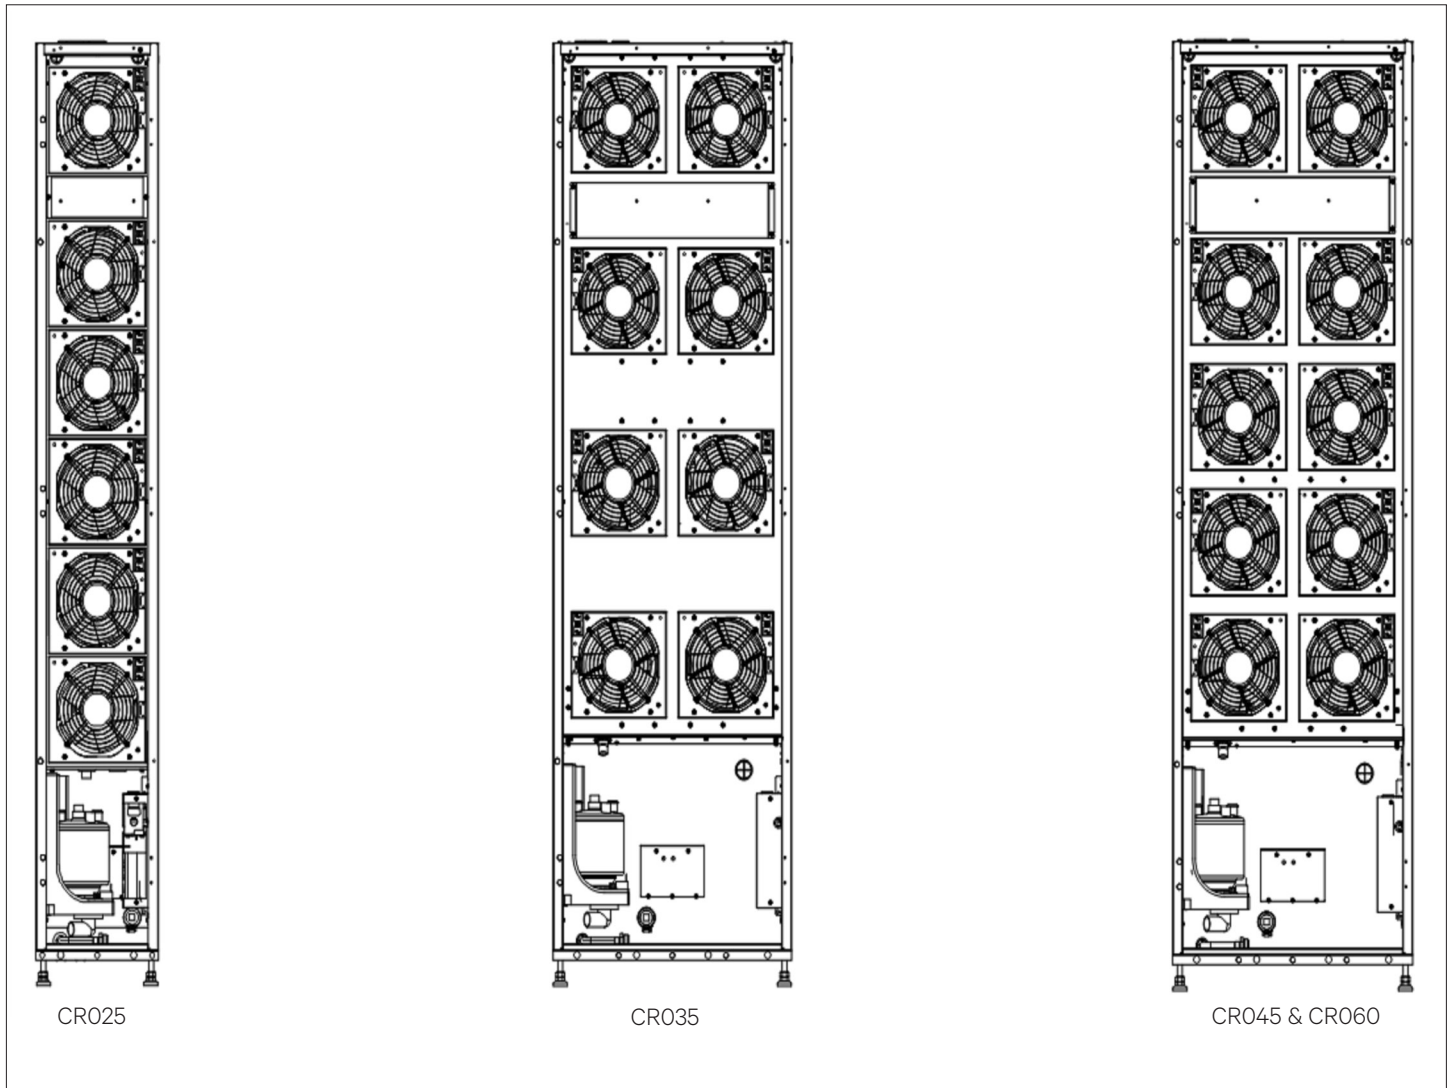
Locations of Front Air Outlets (unit: mm)
